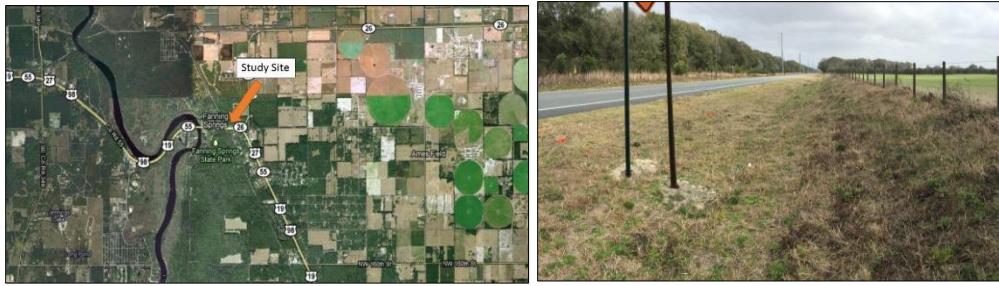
(a) Aerial view of Fanning Springs and surrounding and (b) construction site view
